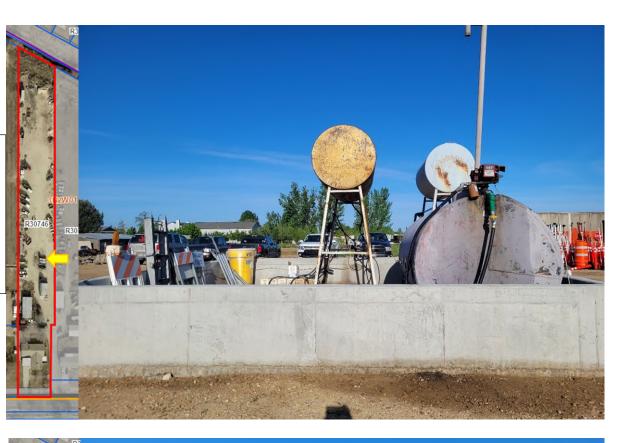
Taken on the subject property, facing northwest towards the staging area.
